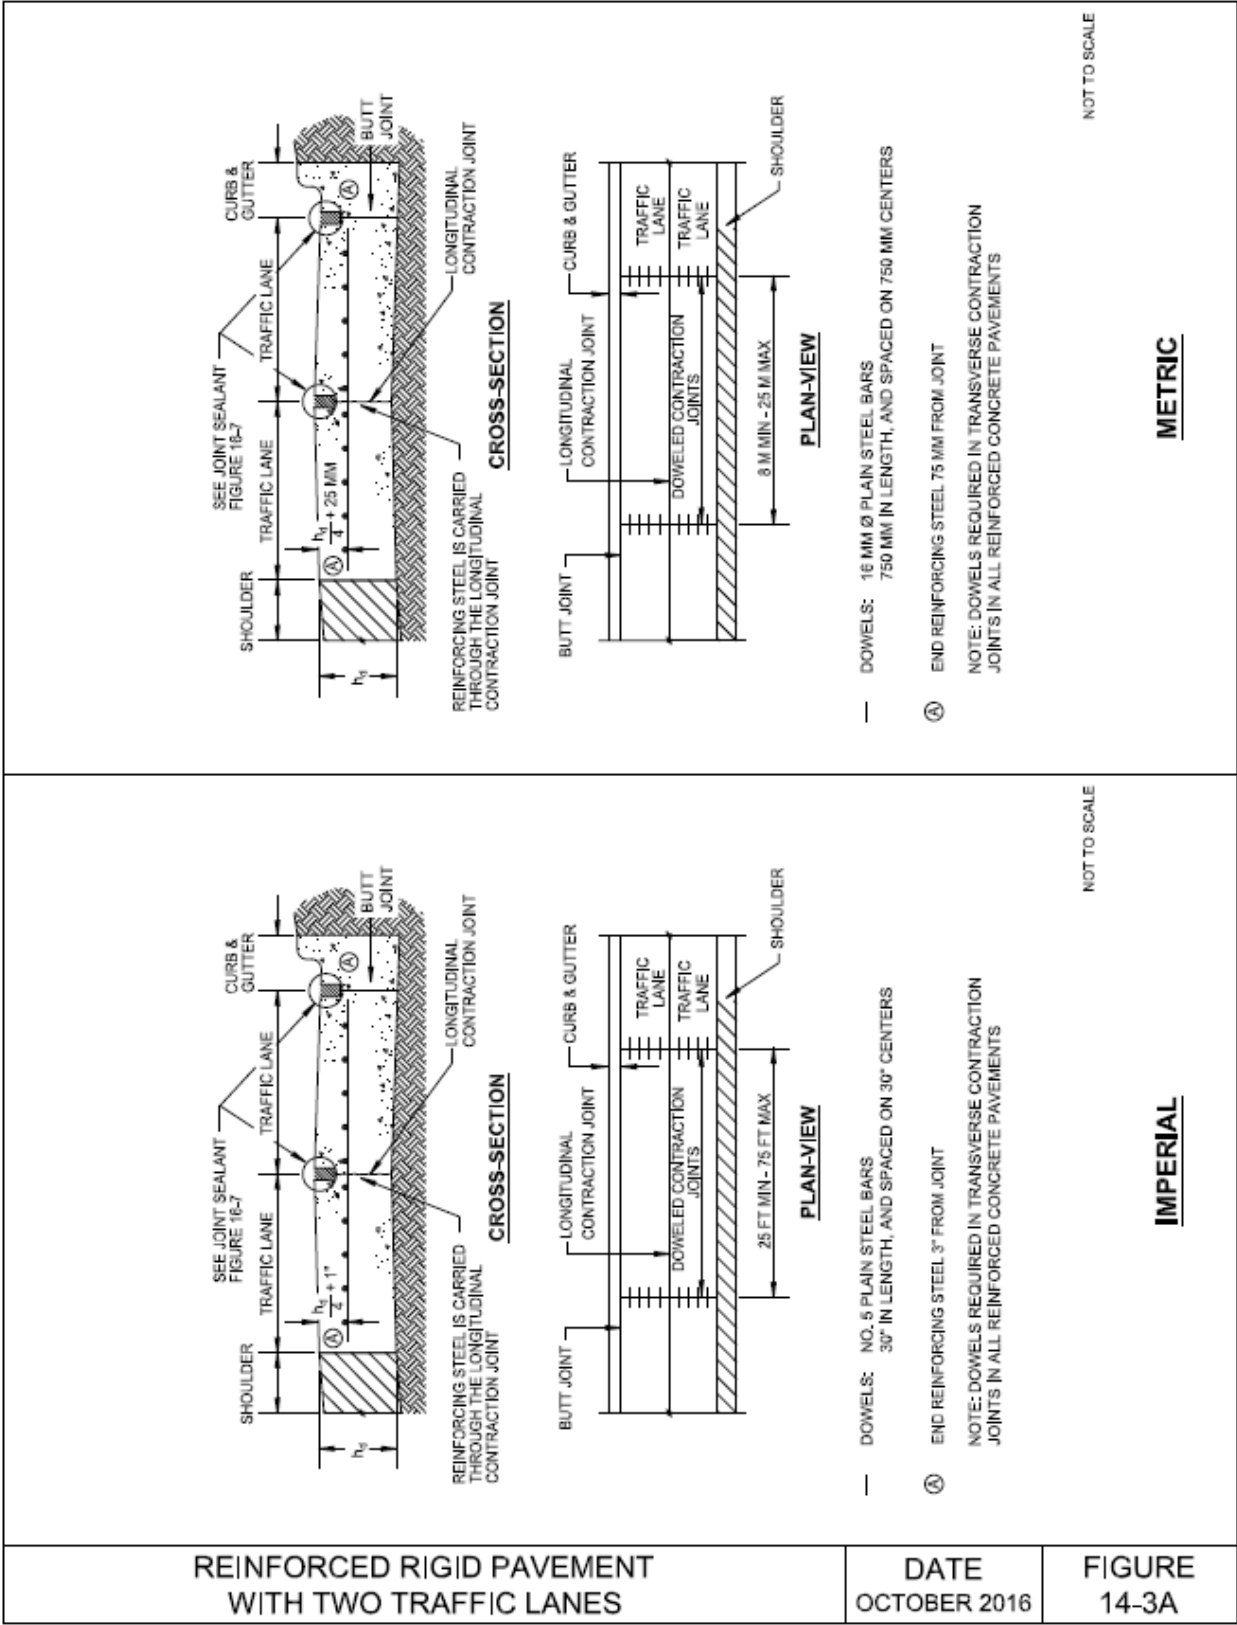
B Reinforced Rigid Pavement with Two Traffic Lanes
